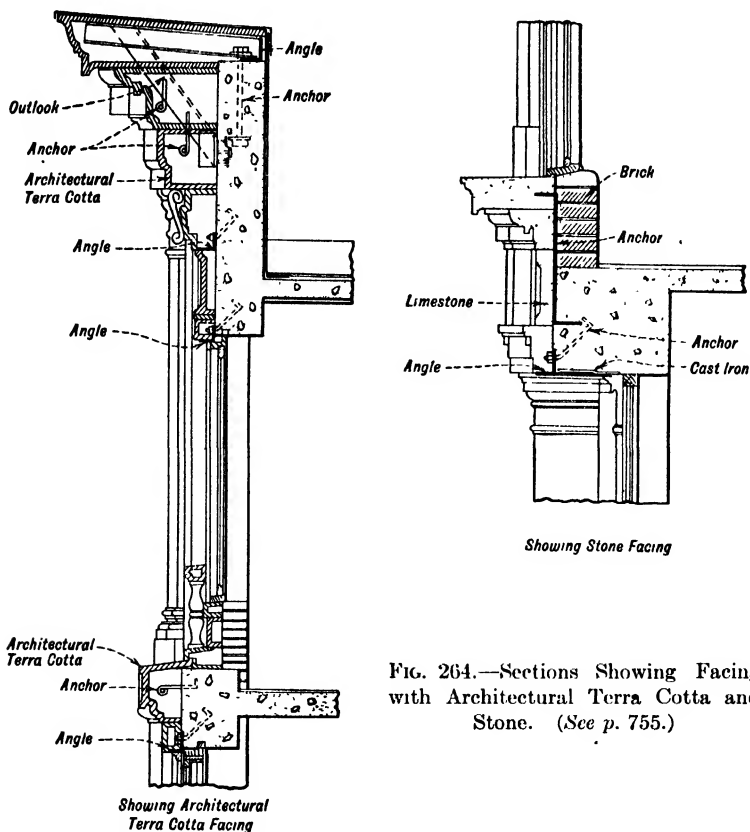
Sections Showing Facing with Architectural Terra Cotta and Stone. (See p. 755.)
